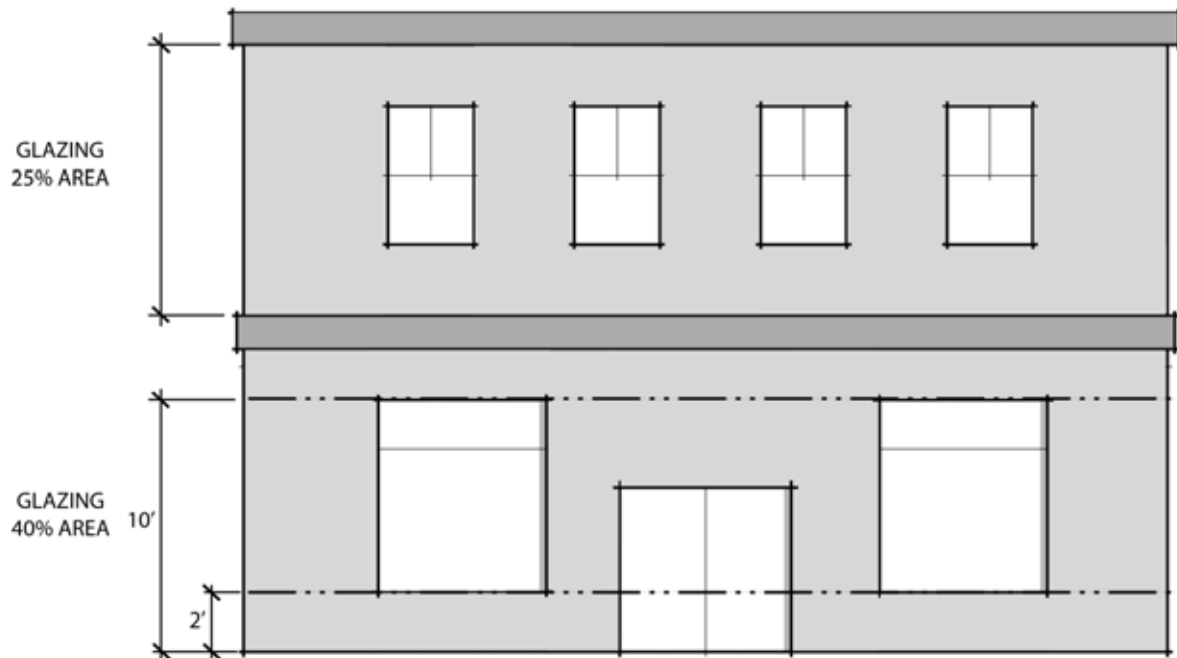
Commercial or mixed use building meeting glazing requirements
